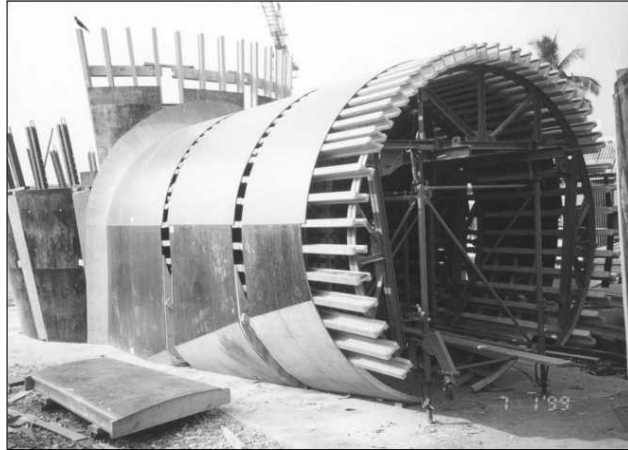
Shuttering in Position for Construction of Junction of Inlet Shaft and Tunnel (Courtesy L&T Formwork).
